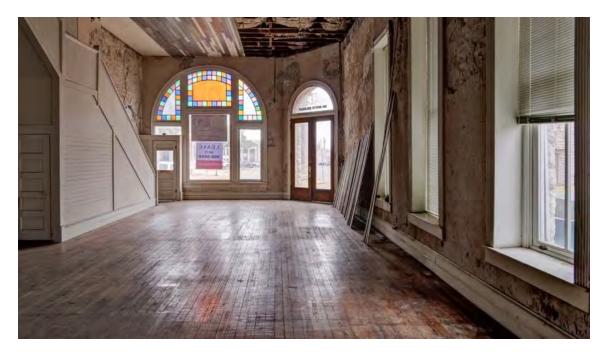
Interior of First Floor Banking Space. Camera facing: East
